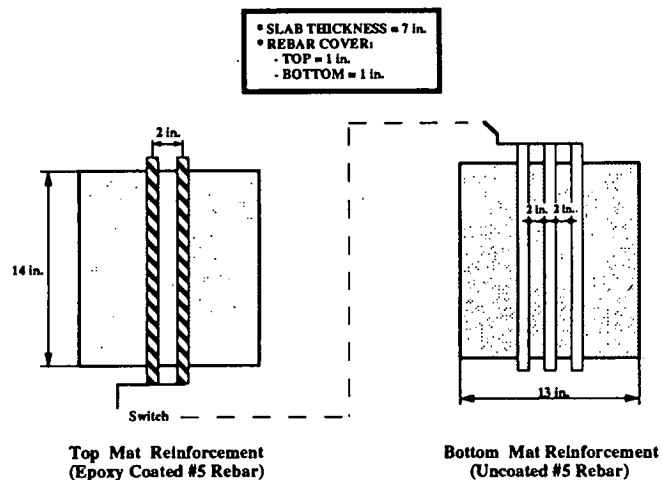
Steel Reinforcement Arrangement of the Test Slabs.
